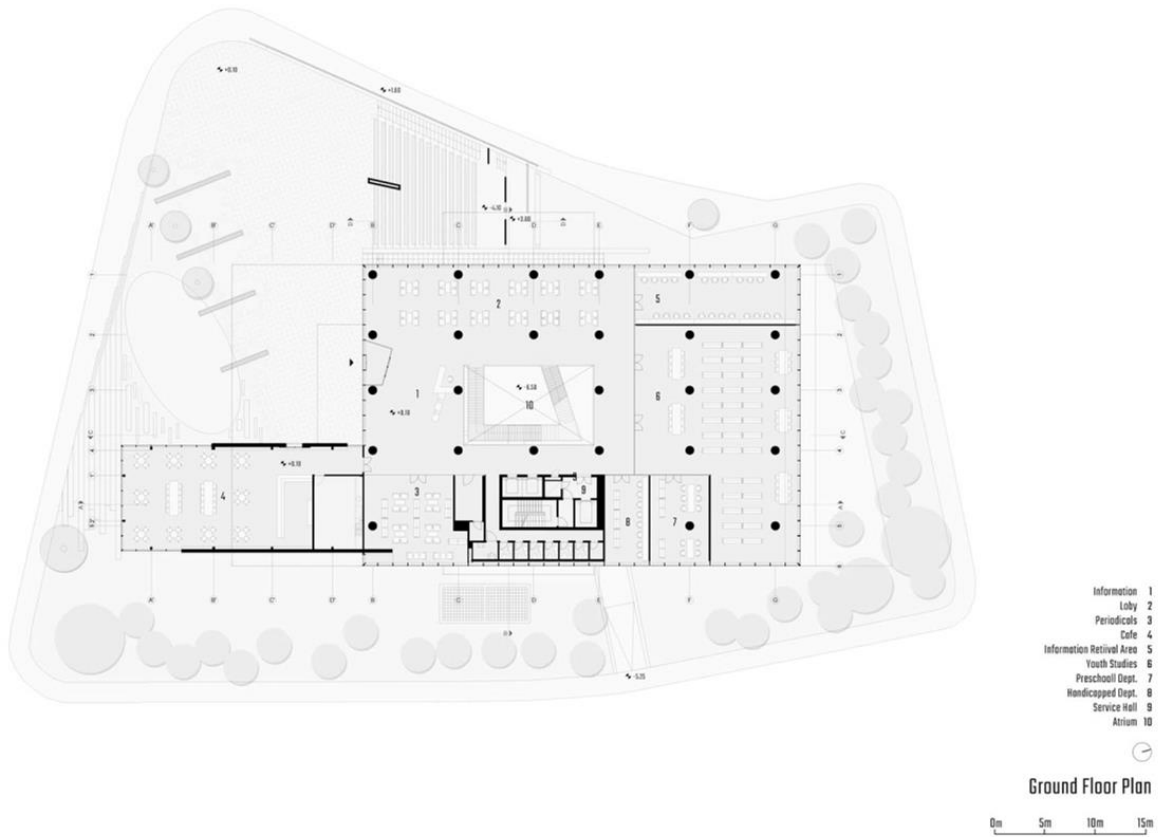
Merkezefendi Library Ground Floor Plan (Çetin, 2024).
